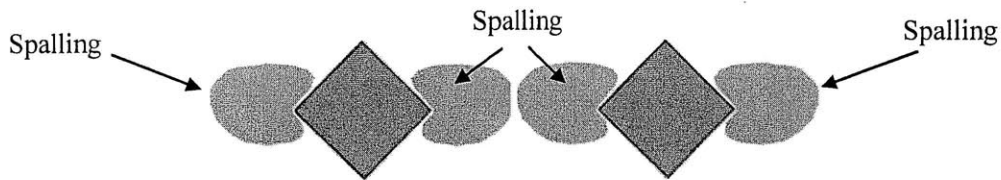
Locations of typical surface spalling occurring in specimen with diamond inclusion pairs.
